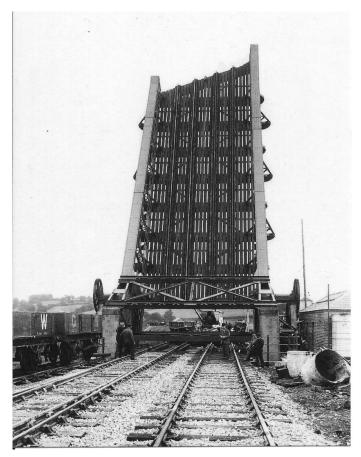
Bascule Bridge undergoing testing c.1911 (private collection)
